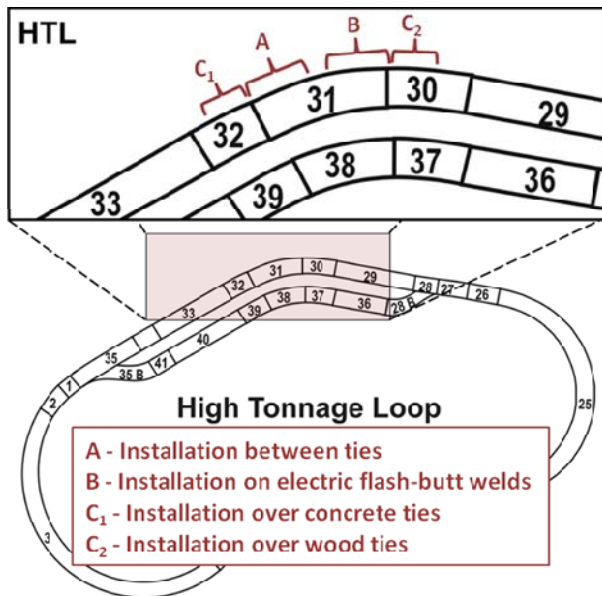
Locations of Railhead Repair Weld Tests at FAST HTL
